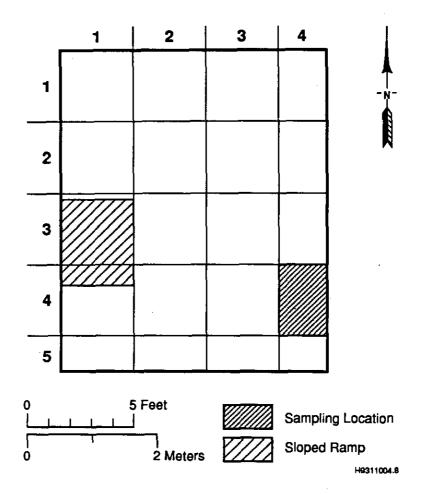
304 Concretion Facility, Changeroom Floor Concrete Chip Sample Location.
